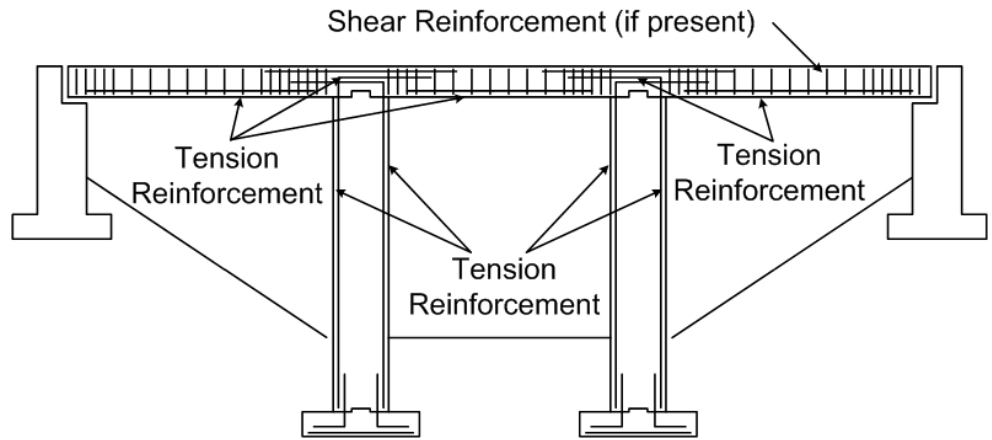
Primary Reinforcement in a Multi-span Slab or Beam Frame
